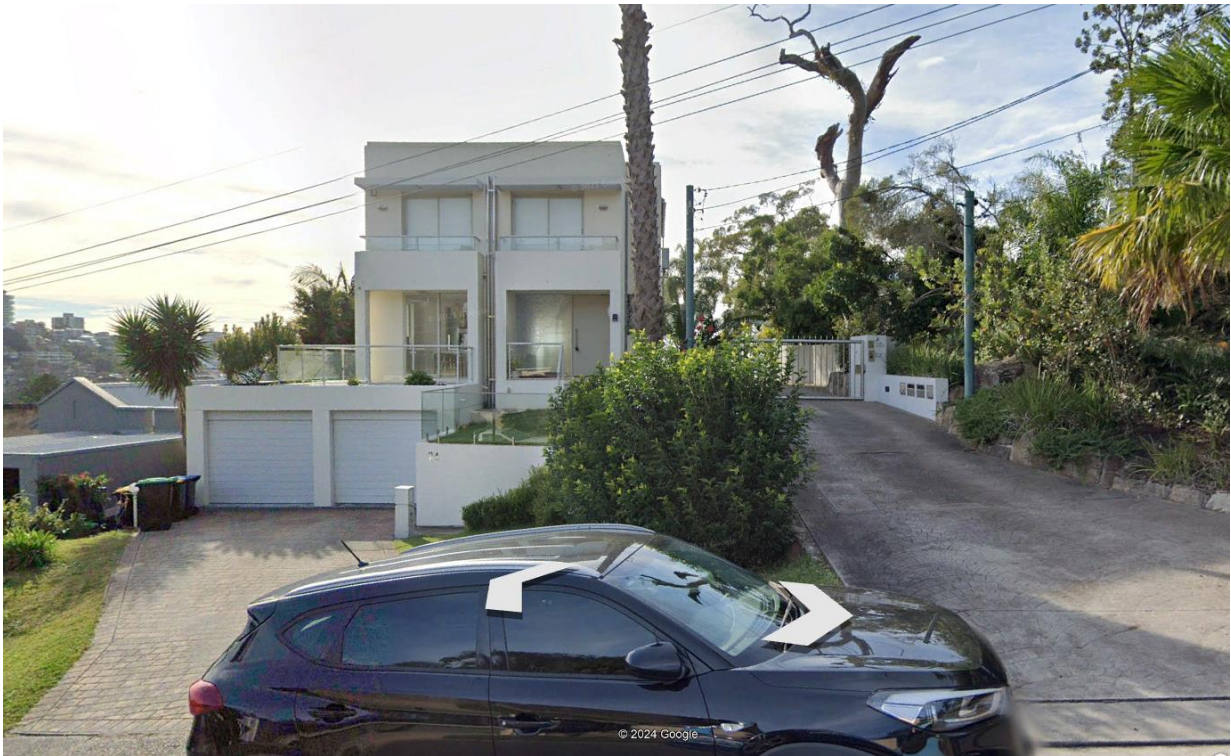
The adjoining property to the north No. 24 Beatty Street and the access driveway to 22A and 22B Beatty Street
